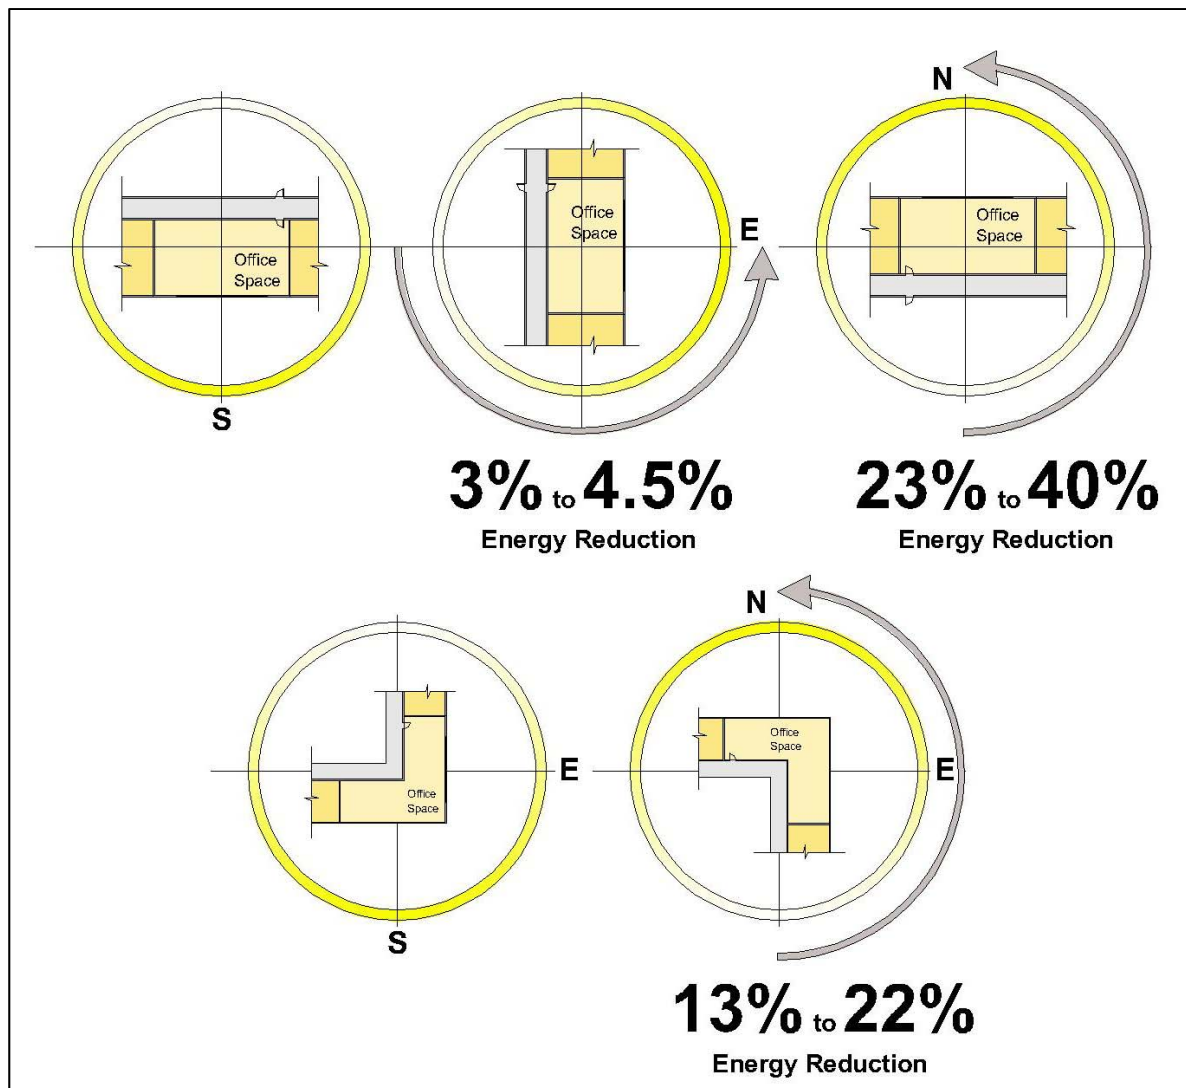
Classifications of offices towers studied according to their floor plan shape.
